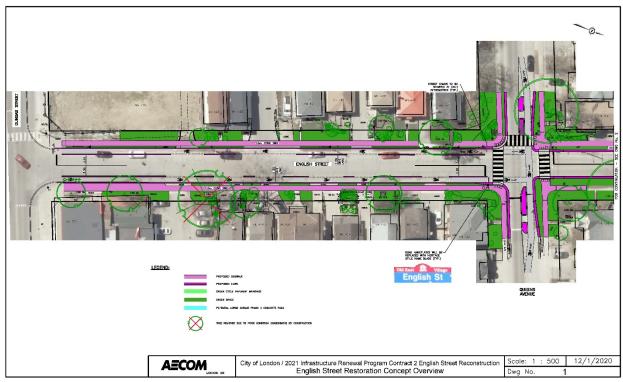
English Street Infrastructure Renewal Project design drawings for English Street between Dundas Street and Queens Avenue.
